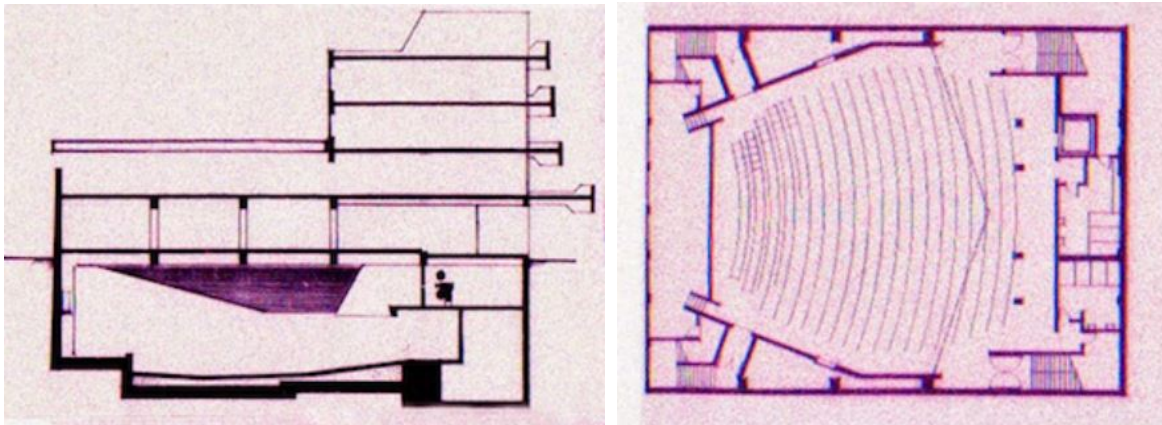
(left). Early sketch, section showing basement and trusses at ground floor (Enrico Taglietti, 1964)
